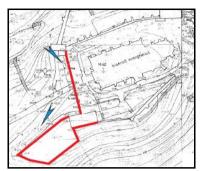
The fortress wall – Section 18, Plan and image, 2007
